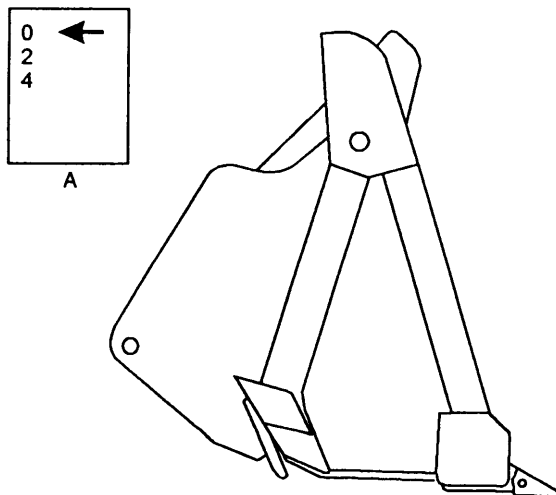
Multitipurpose bucket set in "bucket" position.
